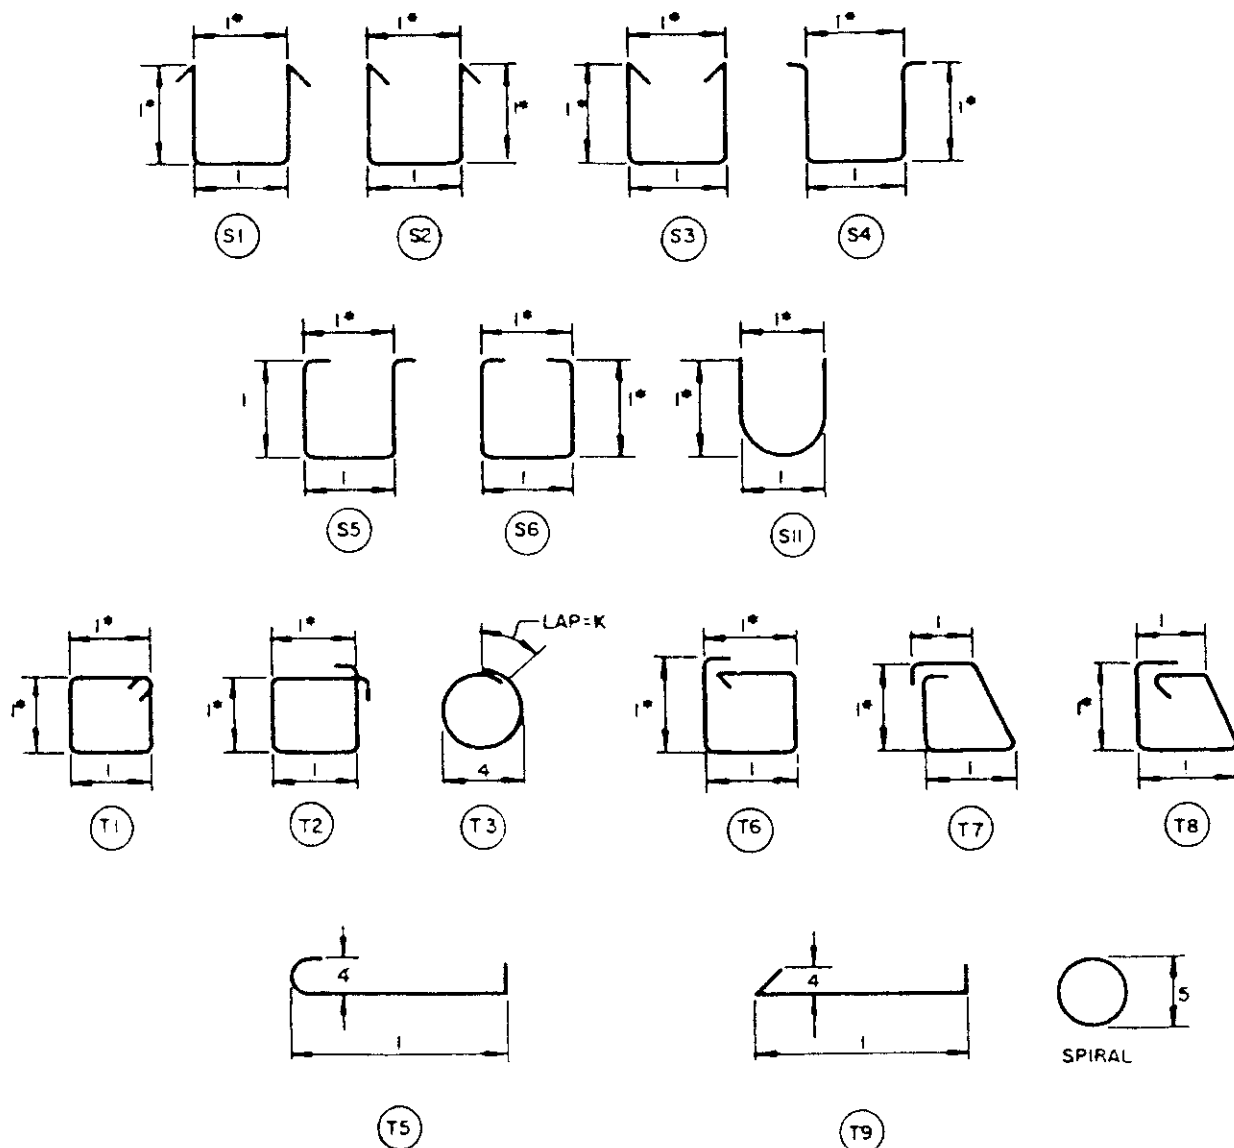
(a) — Standard fabricating tolerances for bar sizes #3 through #11
